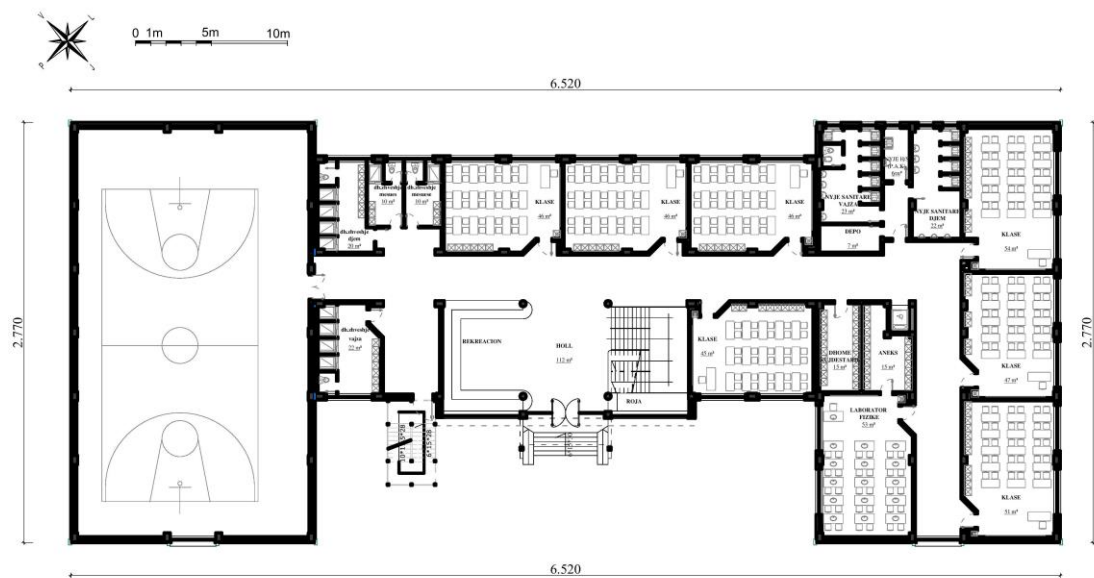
Ground floor plan of school C (Ministria e Arsimit dhe Shkences, 2007)
